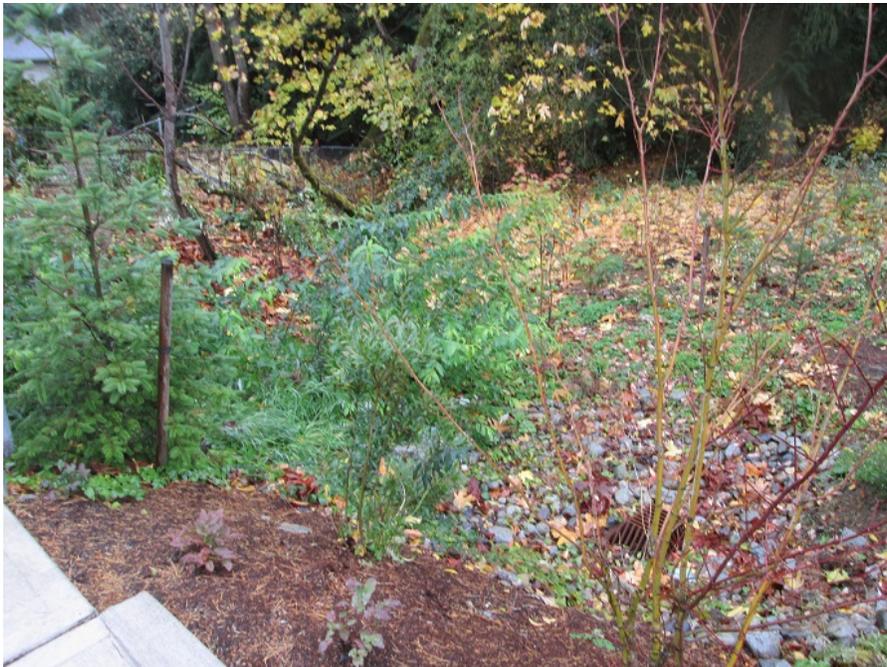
Looking southeast – Flows exit the tight line system and enter the natural drainage channel.
